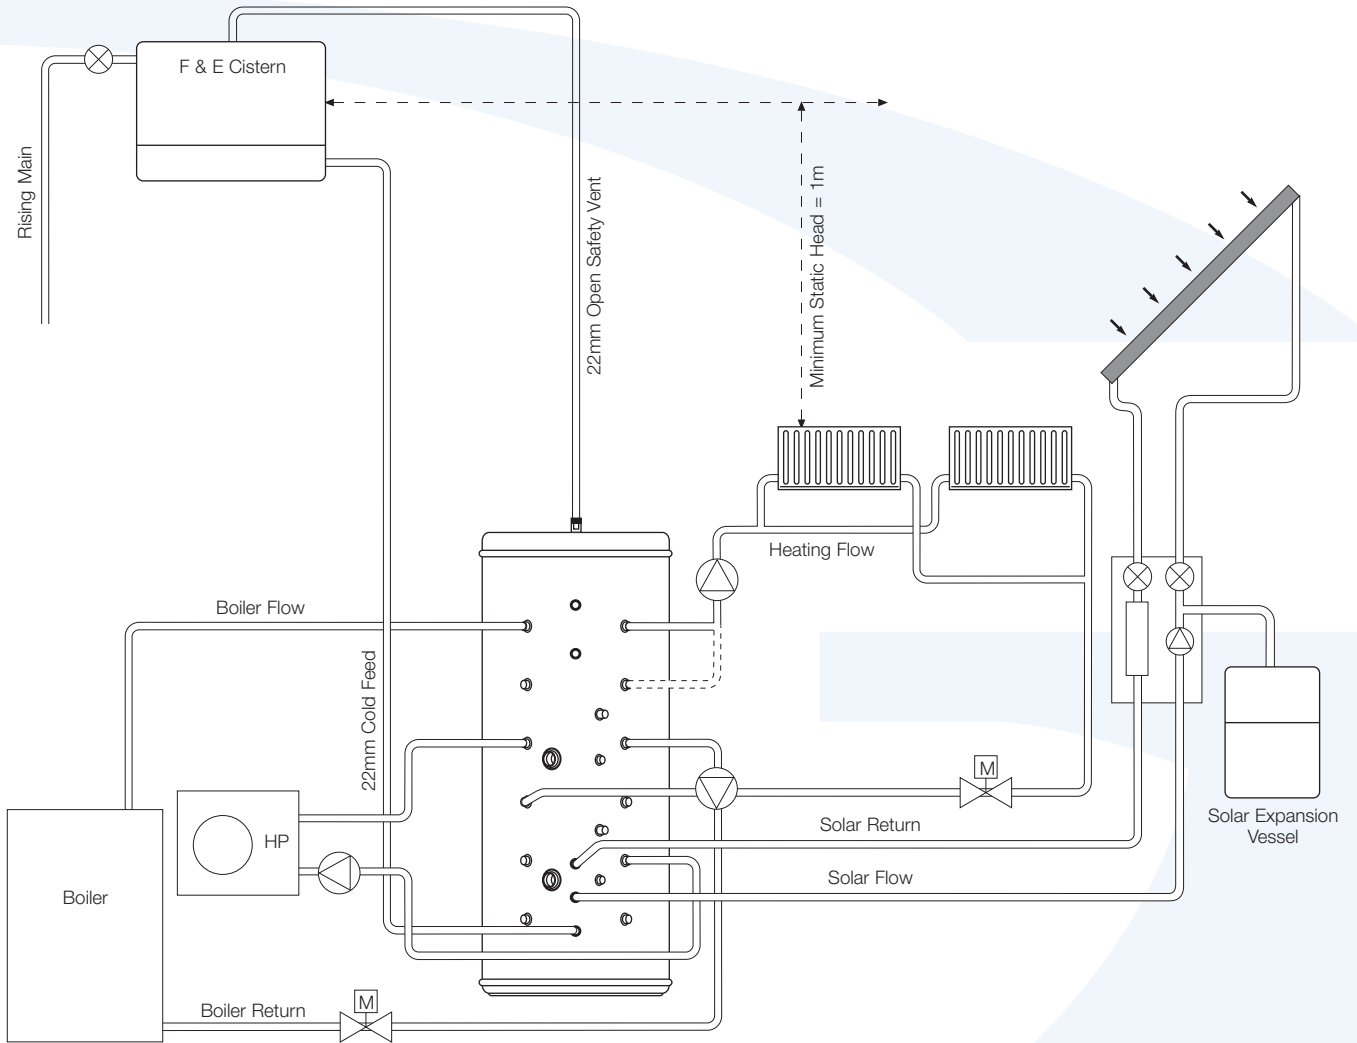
Boiler heat pump and solar thermal with radiator heating circuit
